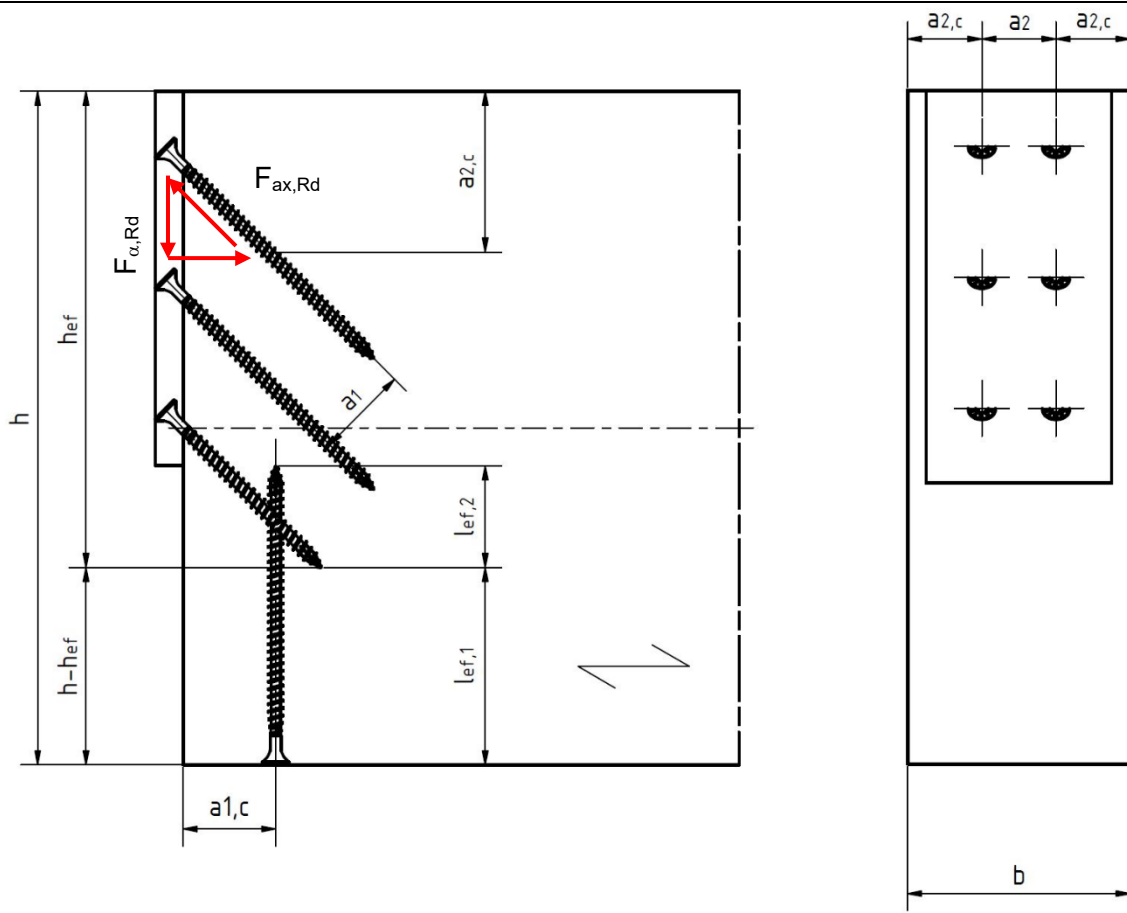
Example of metal-to-timber connection with inclined Schmid Screws located in the end-grain or in side-grain
